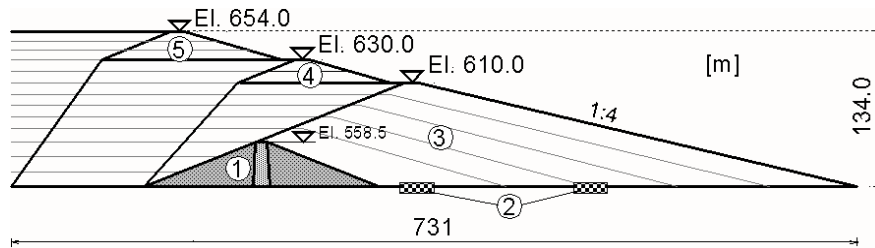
The cross section of Topolnica tailings dam. (1) Starter dam; (2) longitudinal base drainages; (3) first phase sand dam, constructed using downstream method; (4) second phase sand dam, constructed using upstream method; (5) third phase sand dam, constructed using upstream method.
